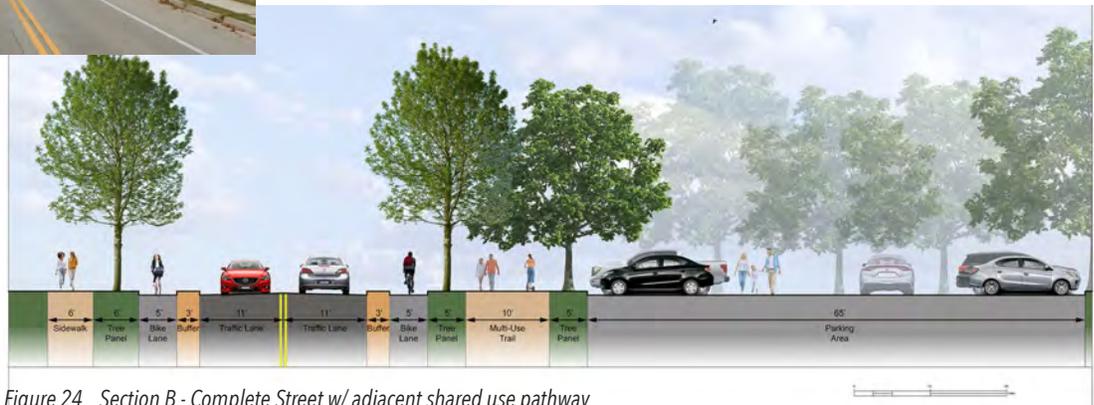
Section B - Complete Street w/ adjacent shared use pathway
